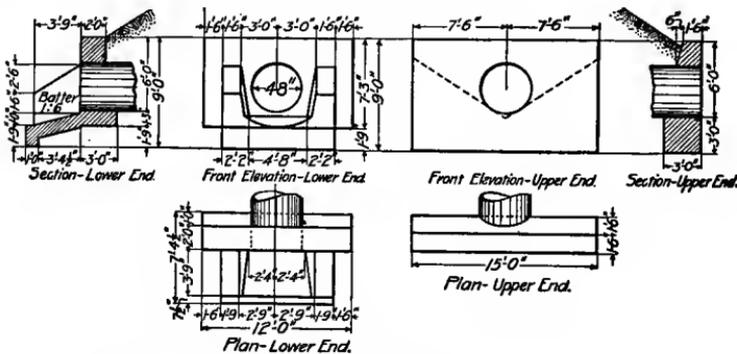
CAST-IRON PIPE CULVERT. A. T. & S. F. R. R.
